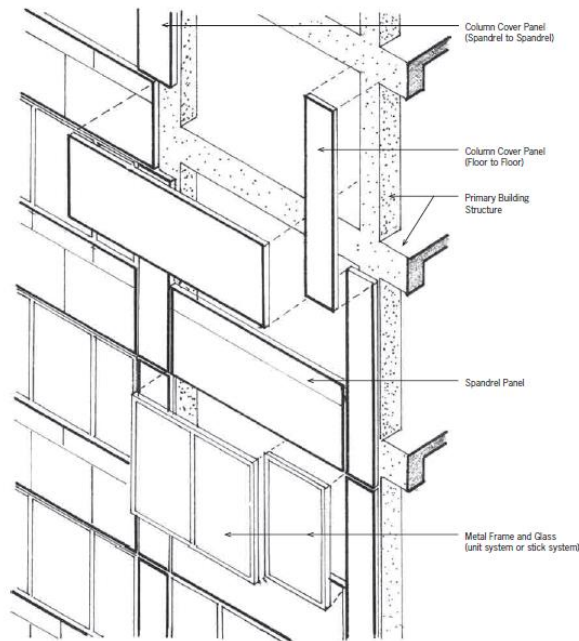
Column cover panels and/or spandrel panels are shop-fabricated and -assembled and installed on the primary building structure. The openings created by the column cover and spandrel panels are stick-built or unitized framing and glass or other infill. Source:(Boswell, 2013).
